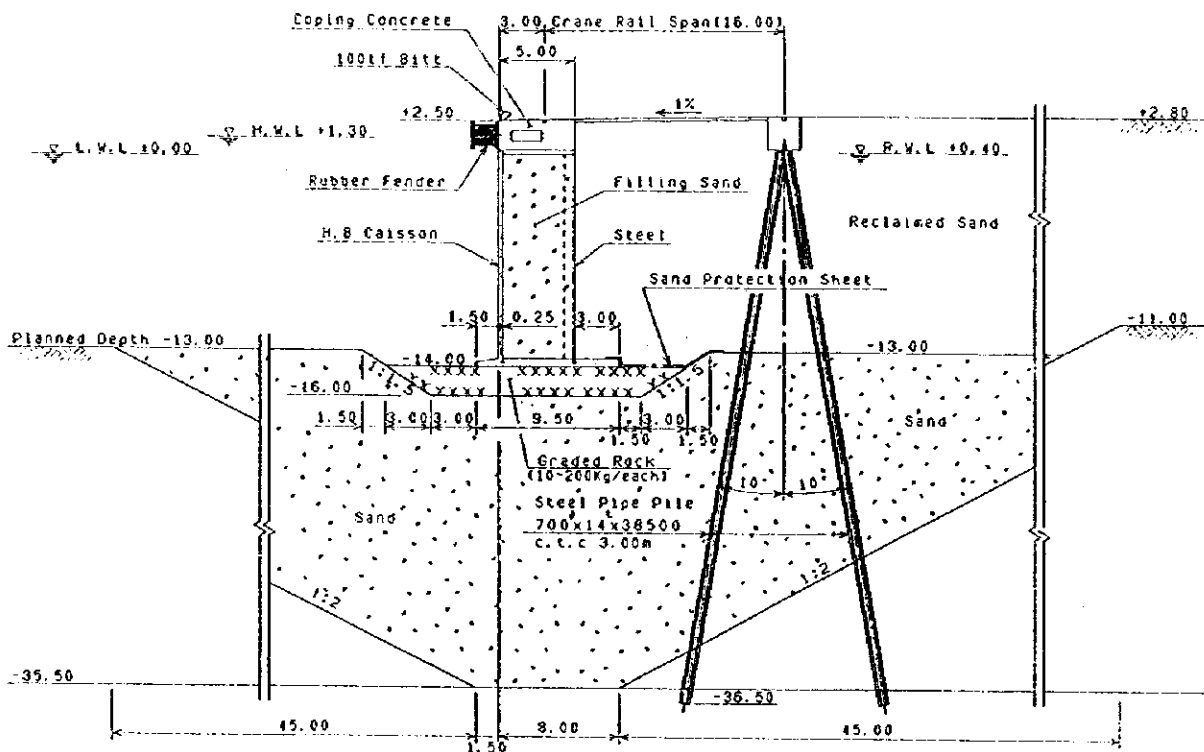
(2) Typical Cross Section of Quaywall W2 (Hybrid Caisson)
